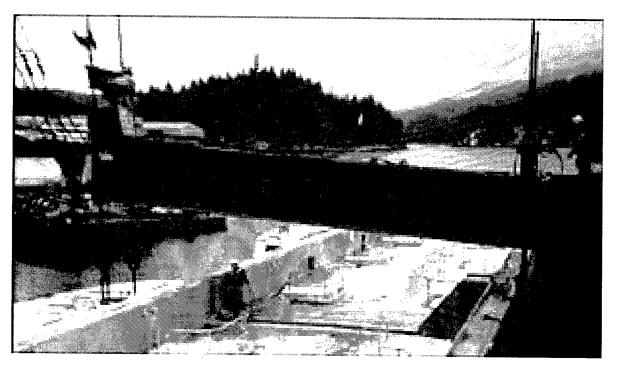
Bonneville Lock guidewall installation, showing the process of lifting float-in wall segments with lift girders and strand jacks
